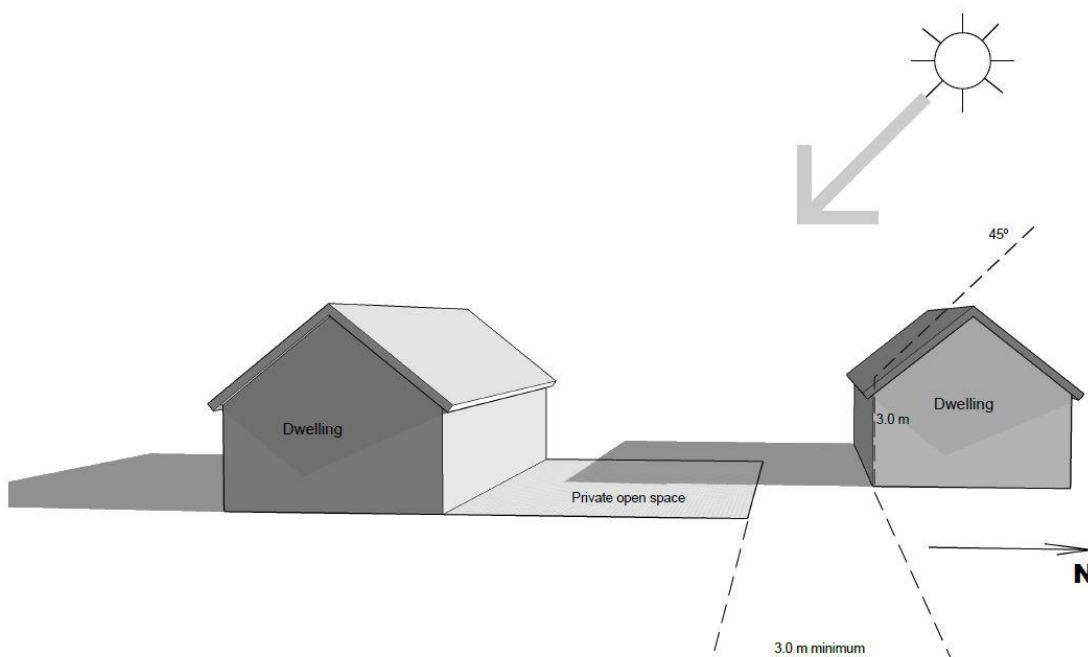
Separation from the private open space of another dwelling on the same site as required by clause 10.4.4 A1(a)
